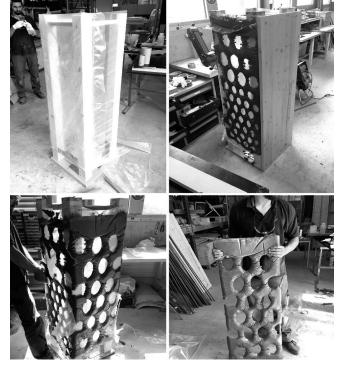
Casting Method of Baggy Pants. Upper Left: welded plastic formwork, Upper Right: concrete cast on one side, Lower Left: cast of corner, Lower Right: demolded cast. (Photographs by author.)
